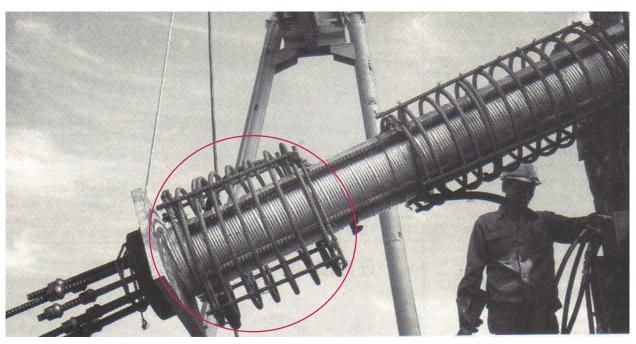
EXISTING ANCHORAGE DURING INITIAL CONSTRUCTION SHOWING BURSTING REINFORCEMENT TO BE RETAINED
